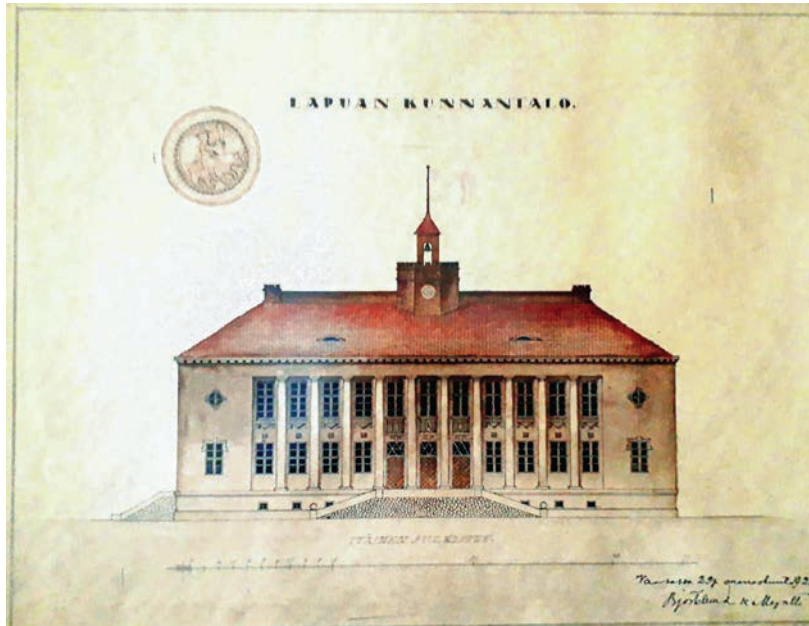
Lapua Town hall. The main façade toward the East. M. Björklund & Myntti, Vaasa 1921. The original is hanging in Lapua Town hall. Photo by the author.
